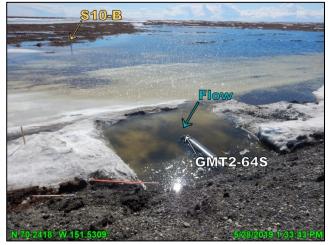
Culvert GMT2-64S blocked by a culvert cap, looking south; May 28, 2019
